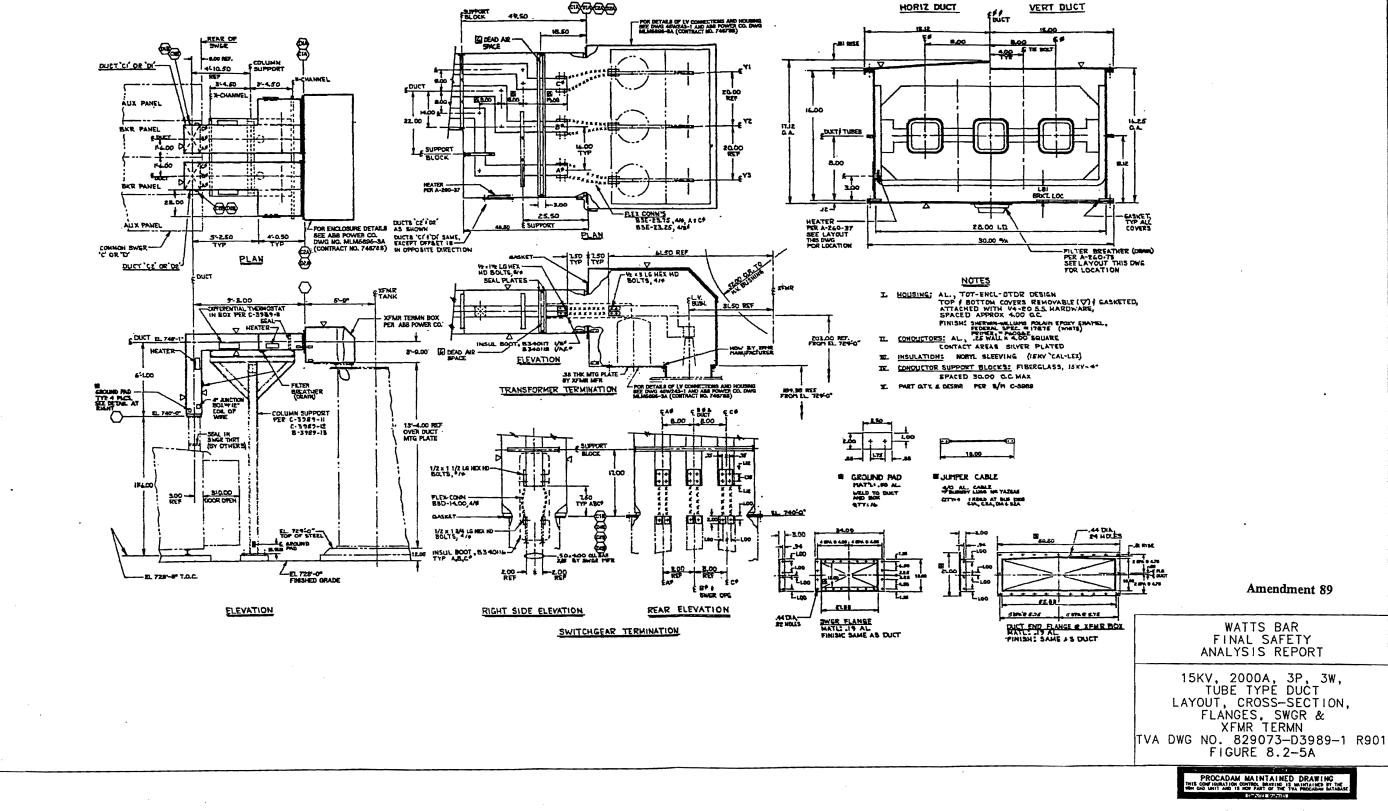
15kV, 2000A, 3P, 3W Tube Type Duct Layout, Cross-Section, Flanges, SWGR & SFMR Termin
